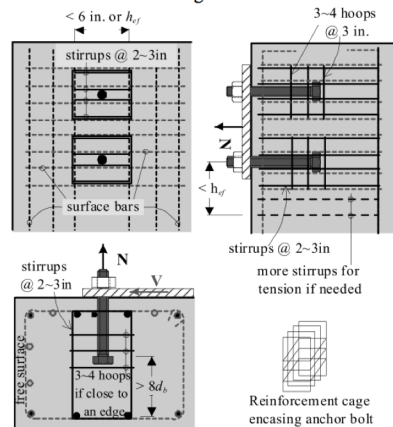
anchor reinforcement for tension.
